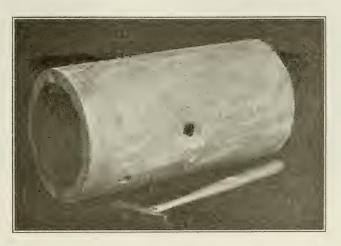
Five inch tile with small opening, and hammer used in making the opening.
